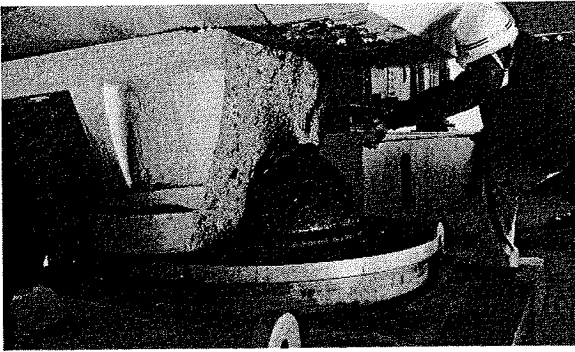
Failure of Fixed Pivot Bearing on Pier 100
